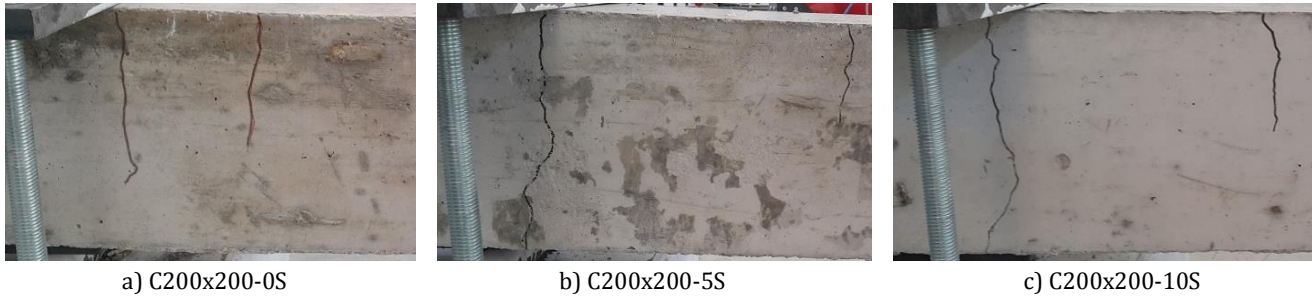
Failure of the C200x200 concrete bollards under impact loading.
